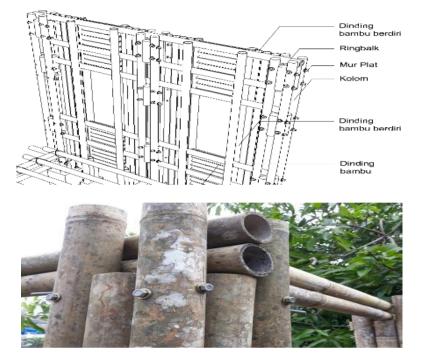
Detailed Images of Ring Balk Construction Applications Simple and Healthy Sustainable Houses Made of Central Kalimantan's Local Bamboo.
